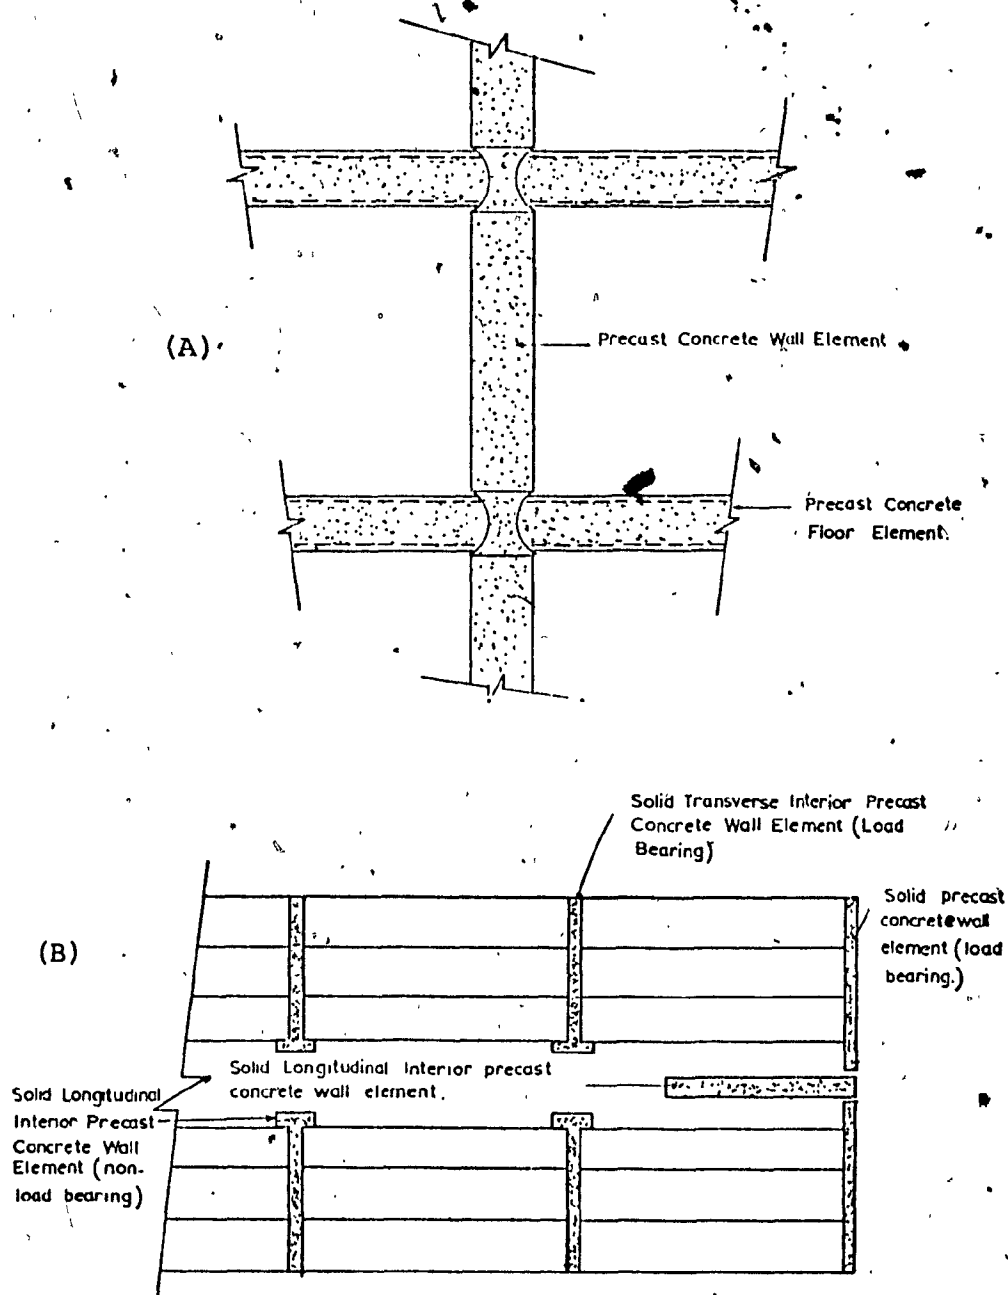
Precast Concrete Wall Elements Showing Building in Plan and Section
